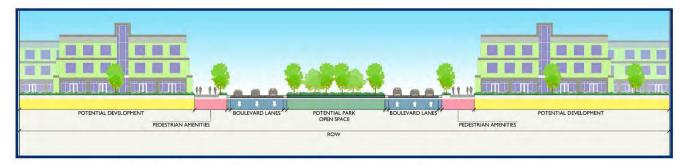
Concept 5 At-grade Boulevard (Tight Cross Section)
